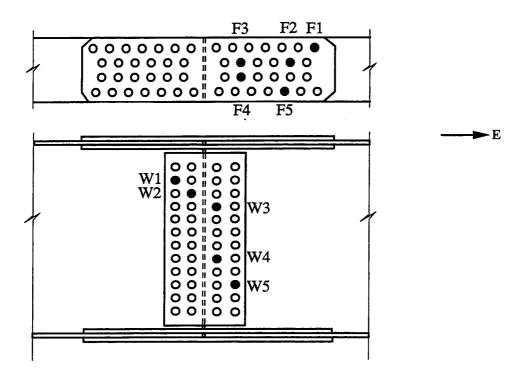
(b) Location of sampled bolts in connection E2 of bridge B3
